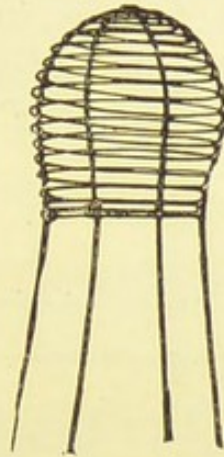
Wire guard for the outlet of ventilating pipes.
